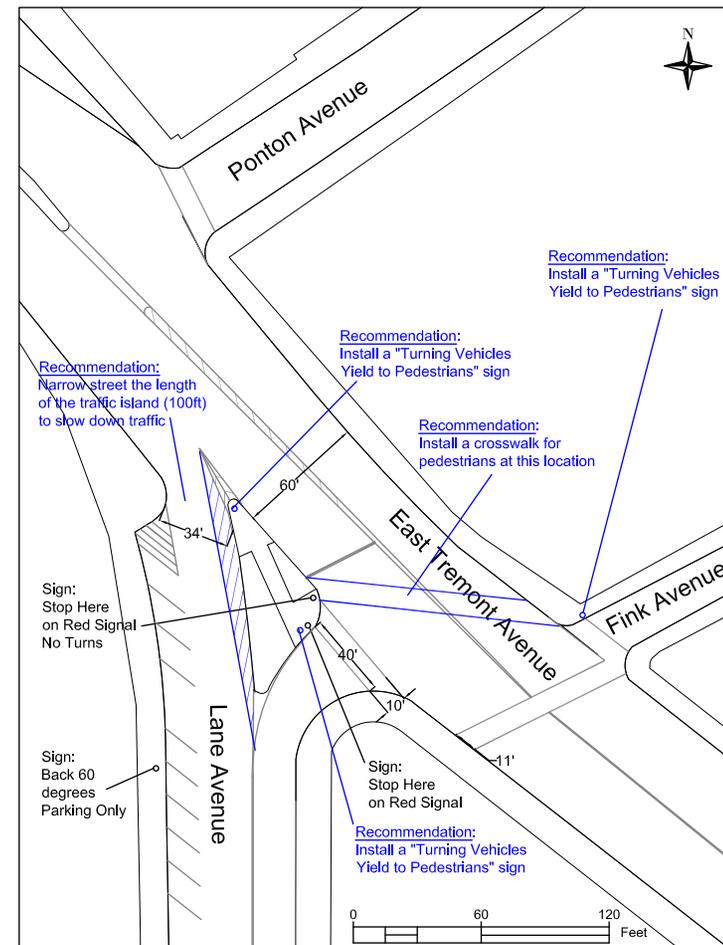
East Tremont Avenue between Fink, Ponton and Lane Avenues (with proposed improvements)
